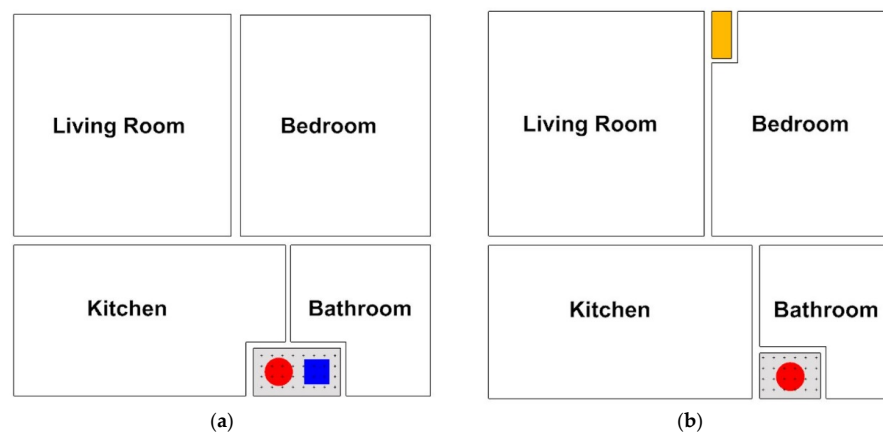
Schematic typical floor plan of a one-bedroom unit: (a) conventional building: Each unit has one closet accommodating a natural gas hot water heater with an integral storage tank (red circle) and an electric air handler (blue square); (b) Passive House: Each unit has one closet accommodating an electric heat-pump hot water heater with an integral storage tank (red circle). The air handling unit (AHU) for each unit is located behind a wall and accessed by a panel located in the bedroom (yellow rectangle).
